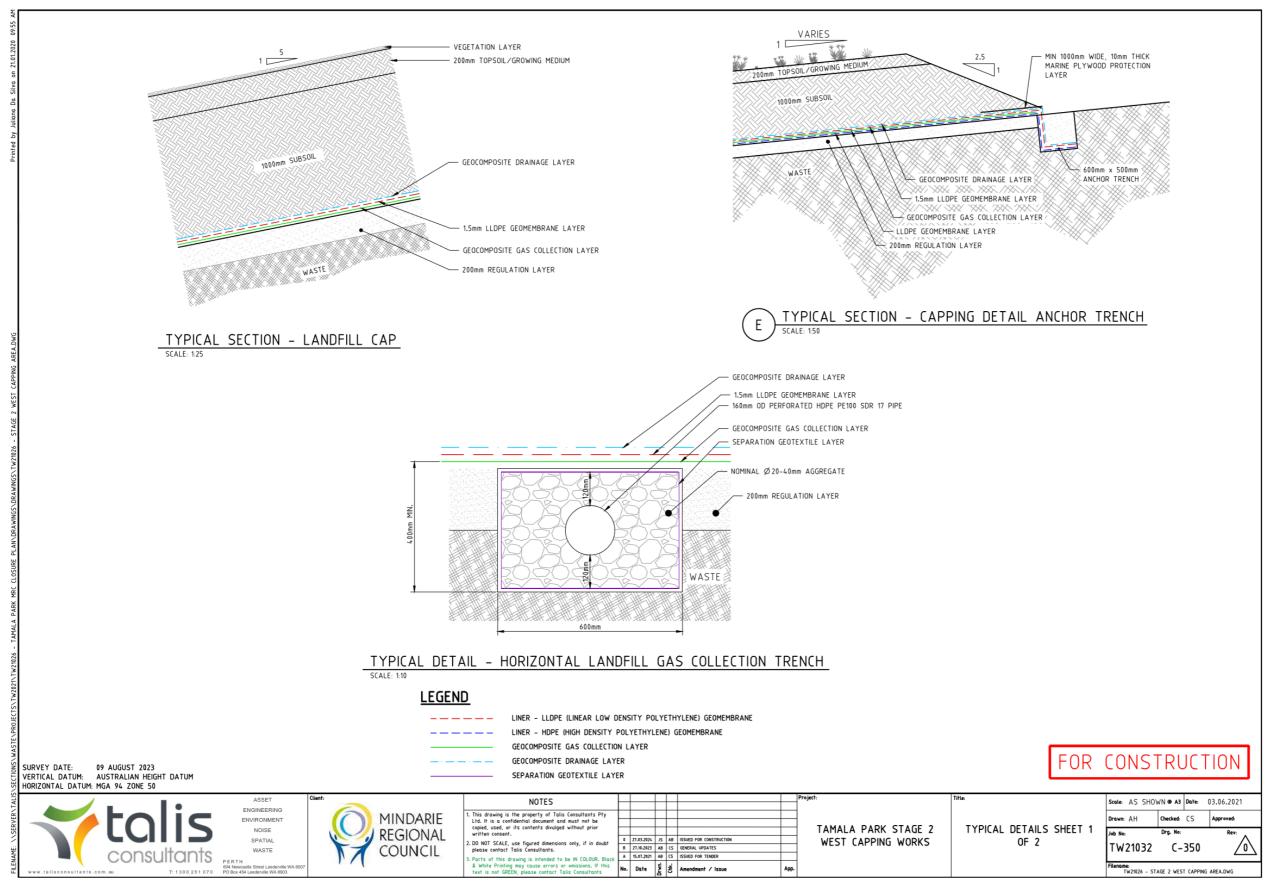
Stage 2 West Capping Works - Landfill Cap, Anchor Trench and Gas Collection Trench Specifications
